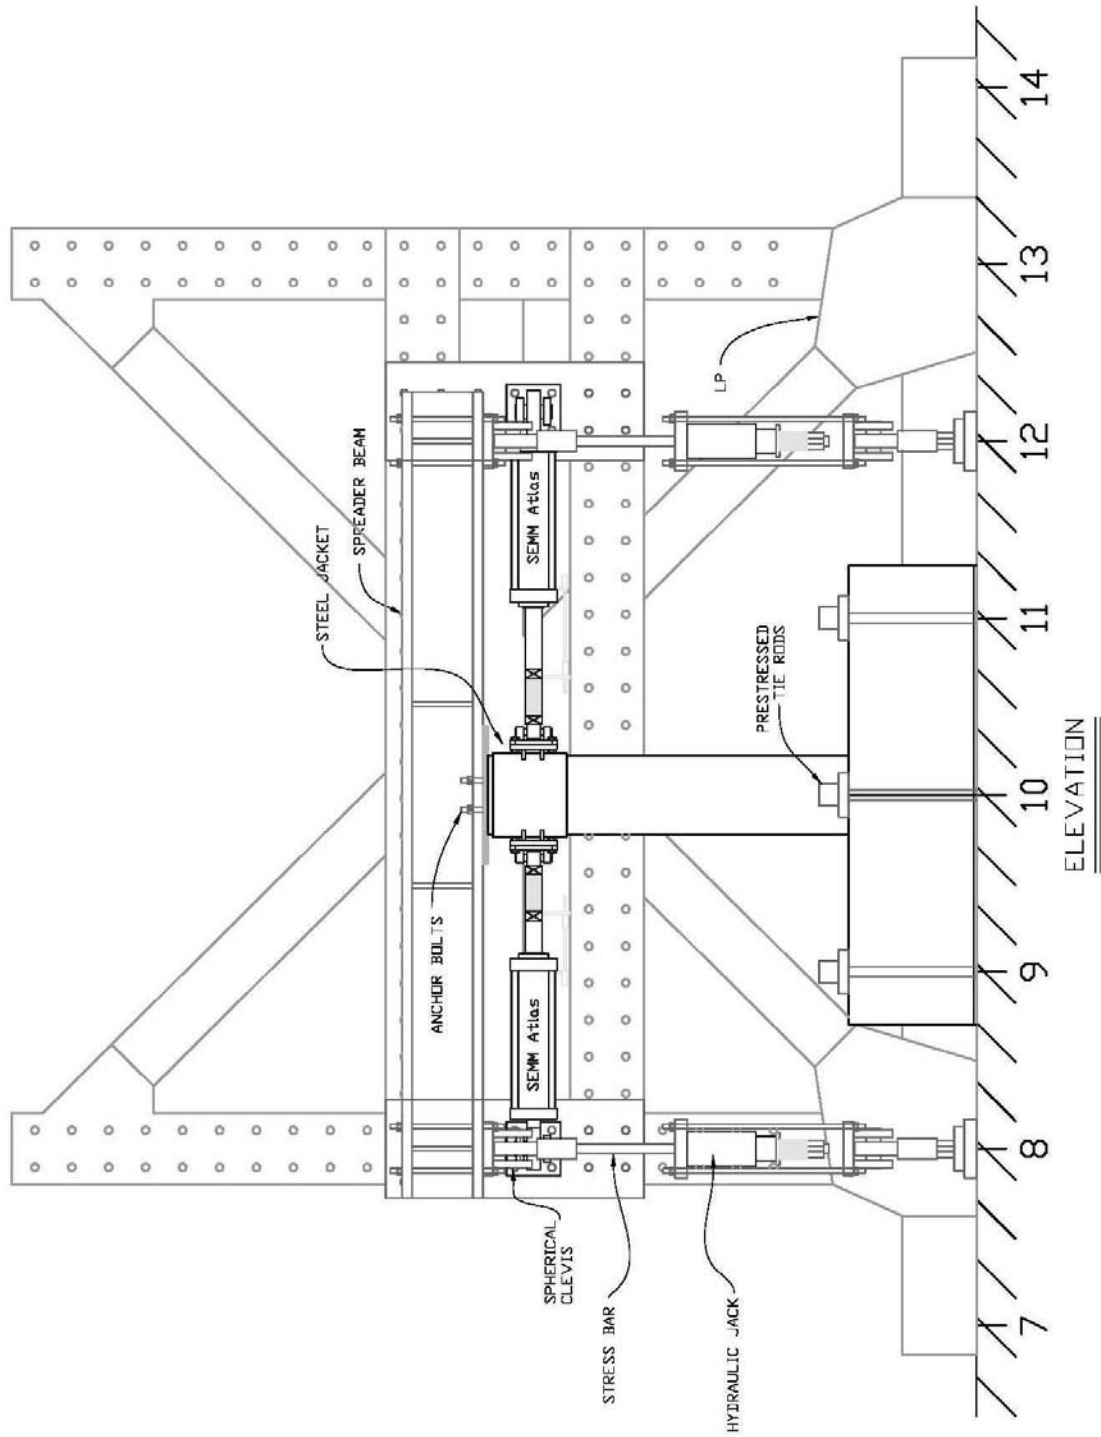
East view of experimental setup of FRC column specimen subjected to bidirectional cyclic loading
